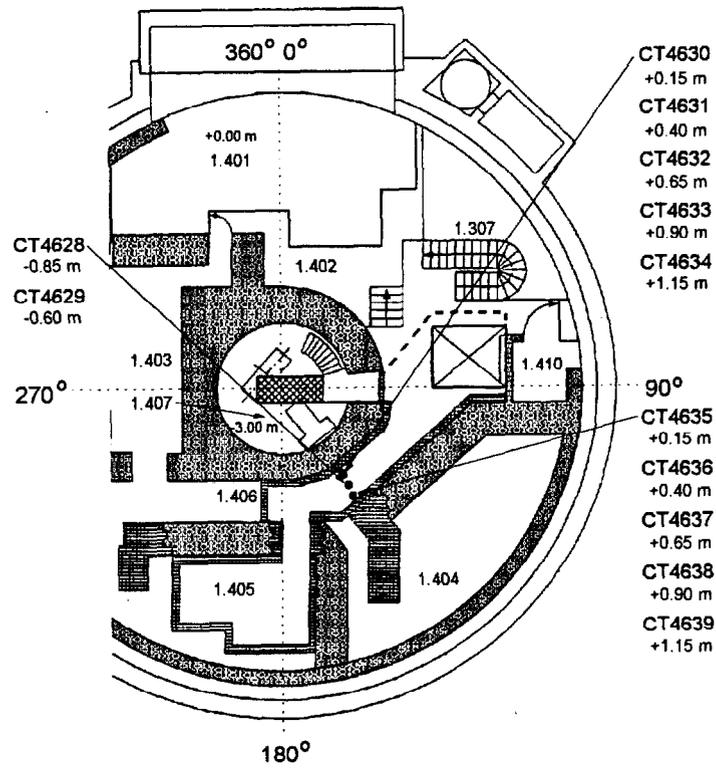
Fire Hallway TC's at the +0.0 m Elevation for T51.2
